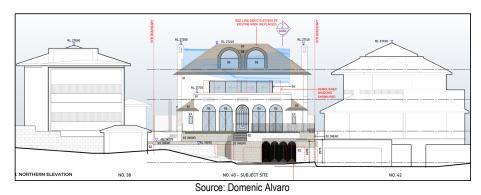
Northern Elevation of 38, 40 and 42 Coolong Road
